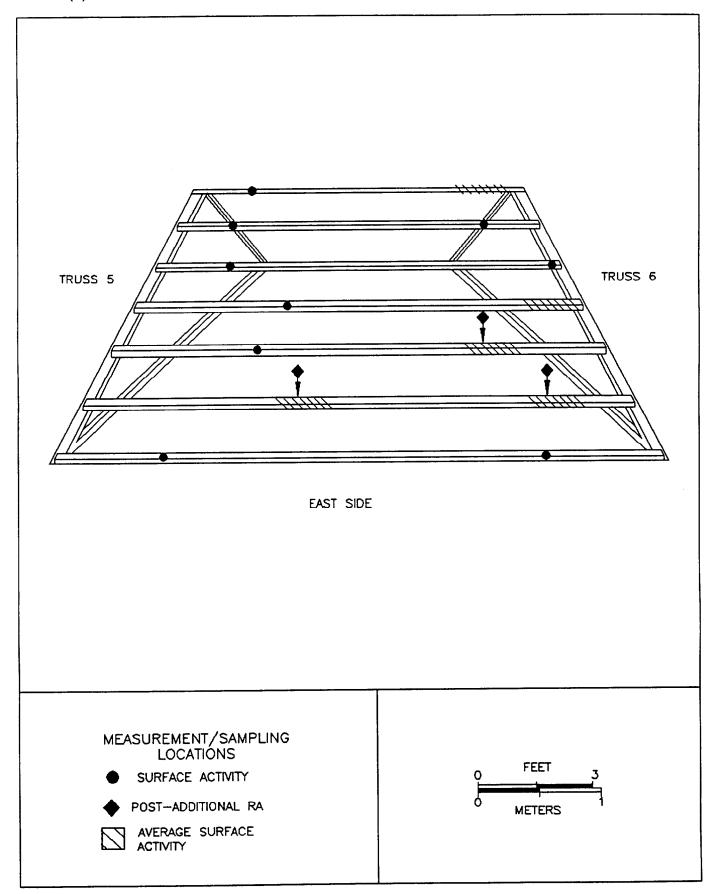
Building 3, Bay 5, East — Measurement and Sampling Locations
